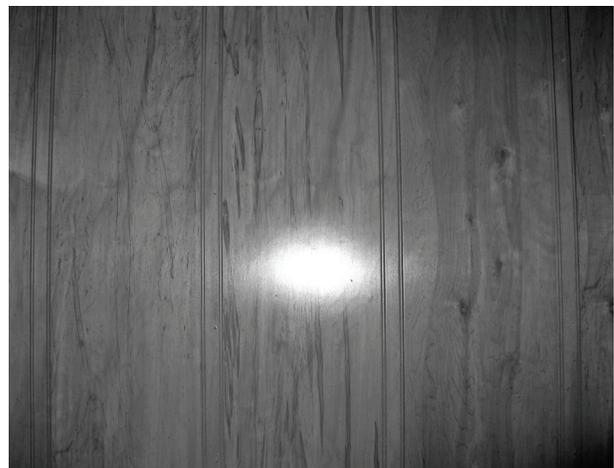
Detail of paneling in Room 107. (NPS-SERO-CR, 2003)
